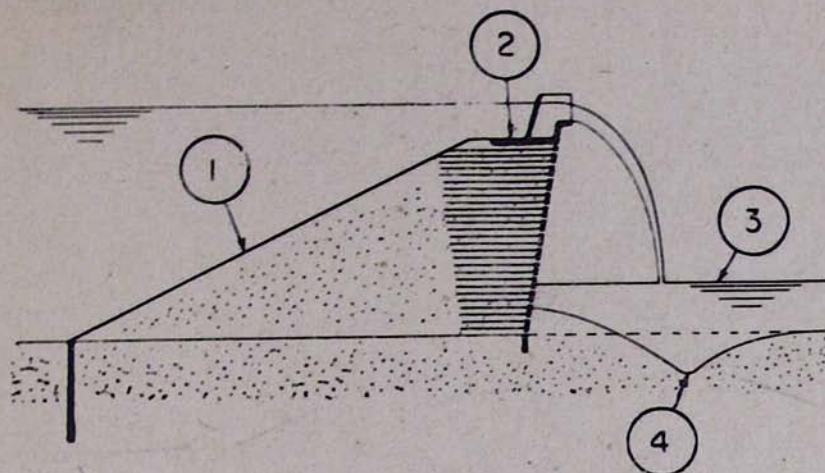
Section of an overflow Reinforced Earth dam. 1—Watertight facing; 2—Concrete apron; 3—Tailwater level; 4—Depth of maximum scour hole.
